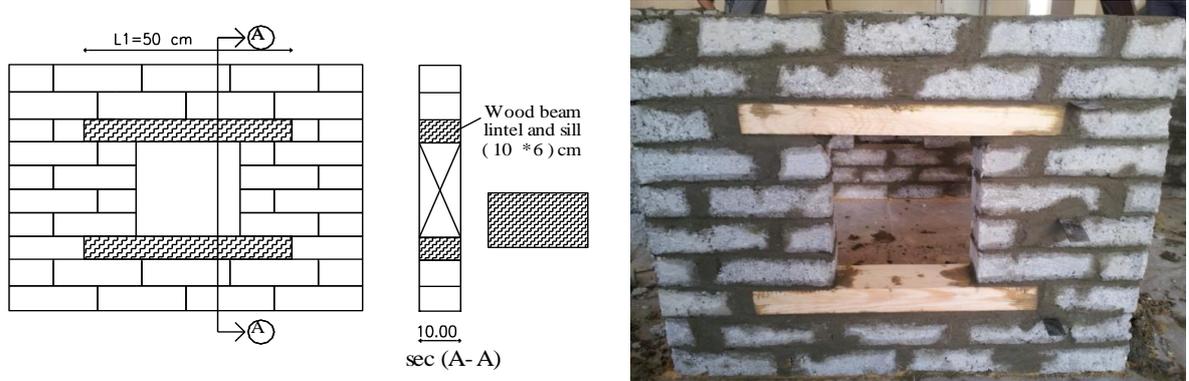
Details of strengthening brick walls with opening using wooden beam at lintel with (L0, L1, L2) (all dimensions with cm)
